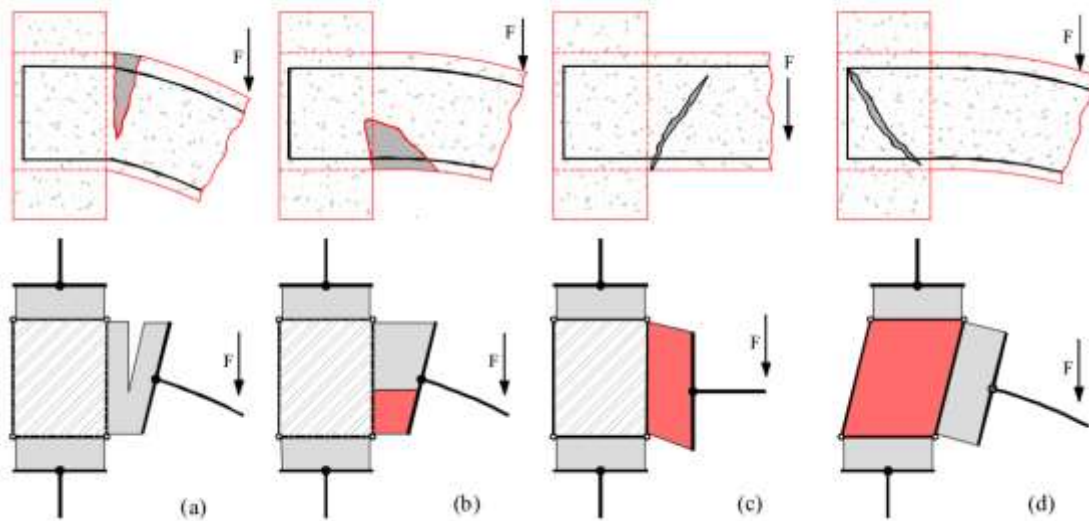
Main failure mechanisms of an external joint (top) and corresponding macro-element simulation (bottom): (a) concrete cracking and yielding of the steel bars; (b) beam concrete crushing; (c) beam shear failure; (d) central joint shear failure.
